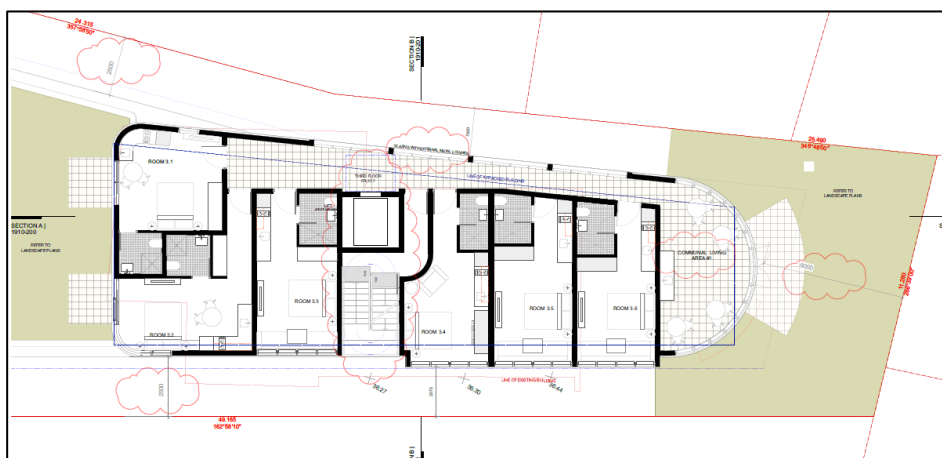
Approved third floor plan under DA/222/2020 (Source: SHED)
